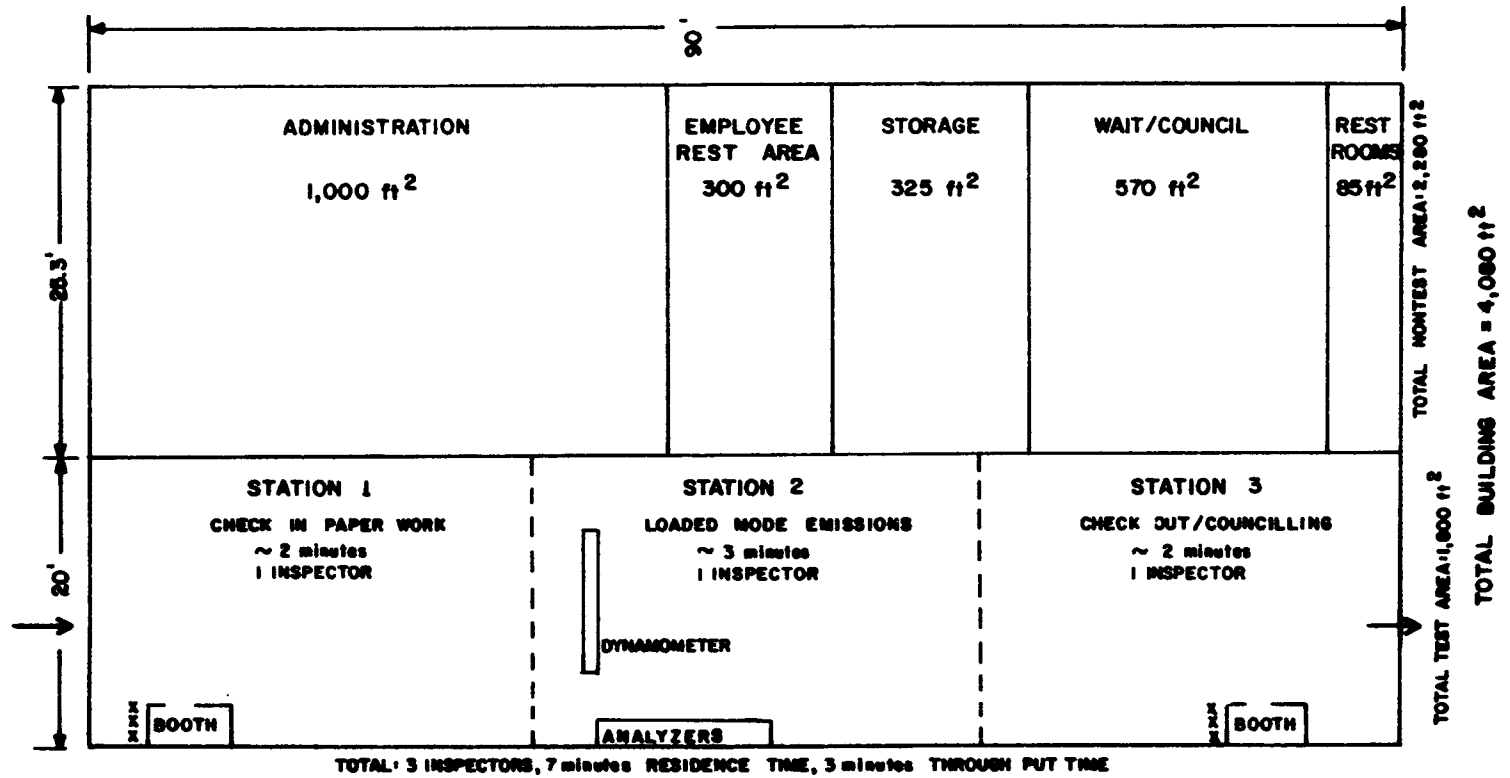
Conceptual floor plan for a one lane loaded mode inspection facility.
